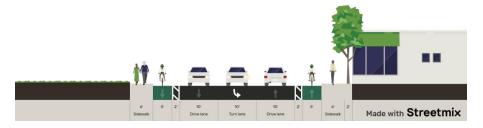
Segment 4 Proposed Cross Section on Herron Avenue from Centre Avenue to Webster Avenue (looking north)
